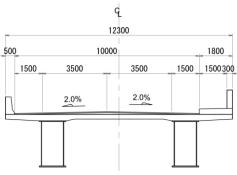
Typical Cross section for 2nd San Juanico Bridge
